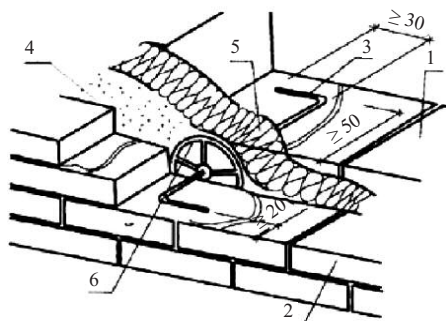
Diagram of the cavity wall according to ITB Instructions [11]: 1 – load-bearing wall, 2 – brick veneer, 3 – anchor, 4 – air space, 5 – insulation, 6 – insulation compression disc
